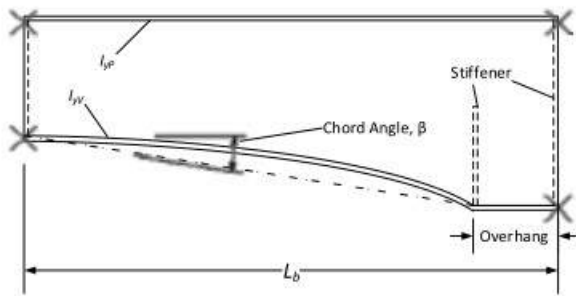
Example Member with a Concave Parabolic Haunch and an Overhang
